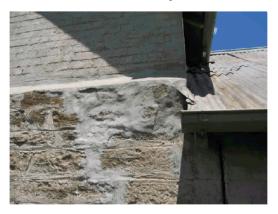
Section of eastern (rear) elevation showing inappropriate cement repair work.
